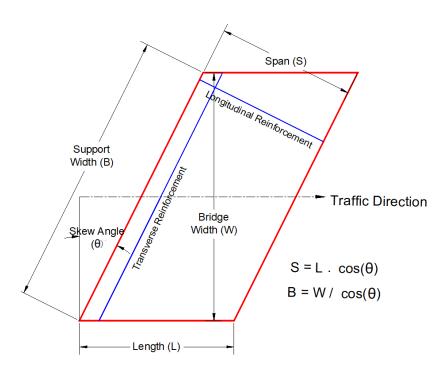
Proposed direction of longitudinal reinforcement in skewed approach slabs and corresponding AASHTO LRFD Section
